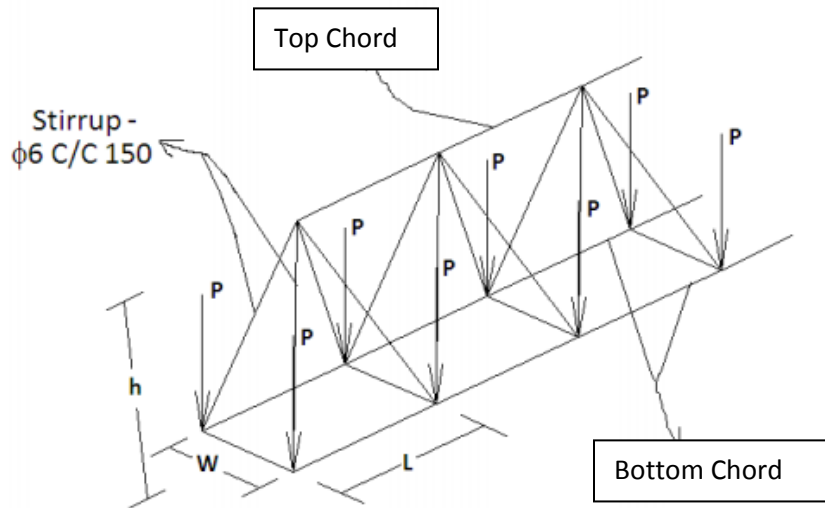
Arrangement and loading of latticed shear reinforcement of plates in the production stage
